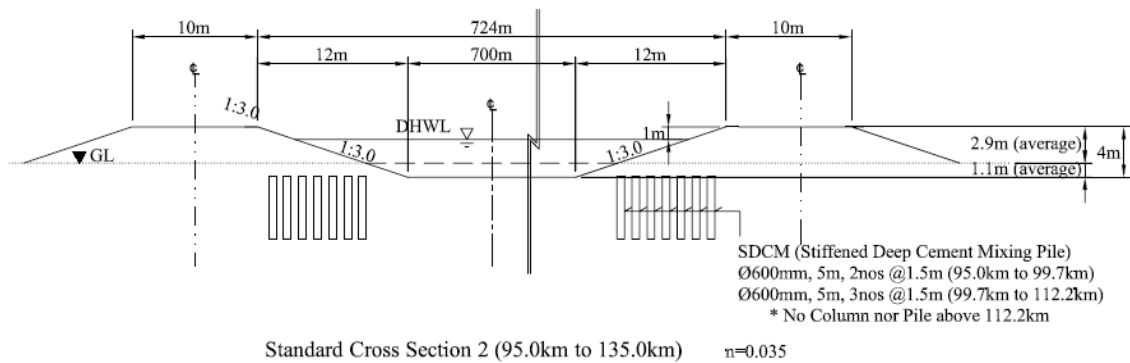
Standard Cross Section of East Diversion Channel with Slope Protection (95km to 135km)
